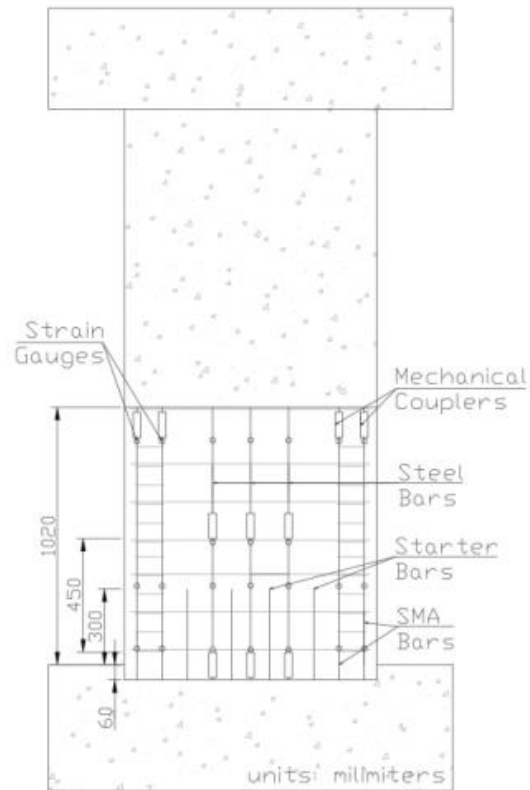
Reinforcement layout of SMA-steel wall (RSWN) (M. Soto-Rojas & Palermo, 2020).
